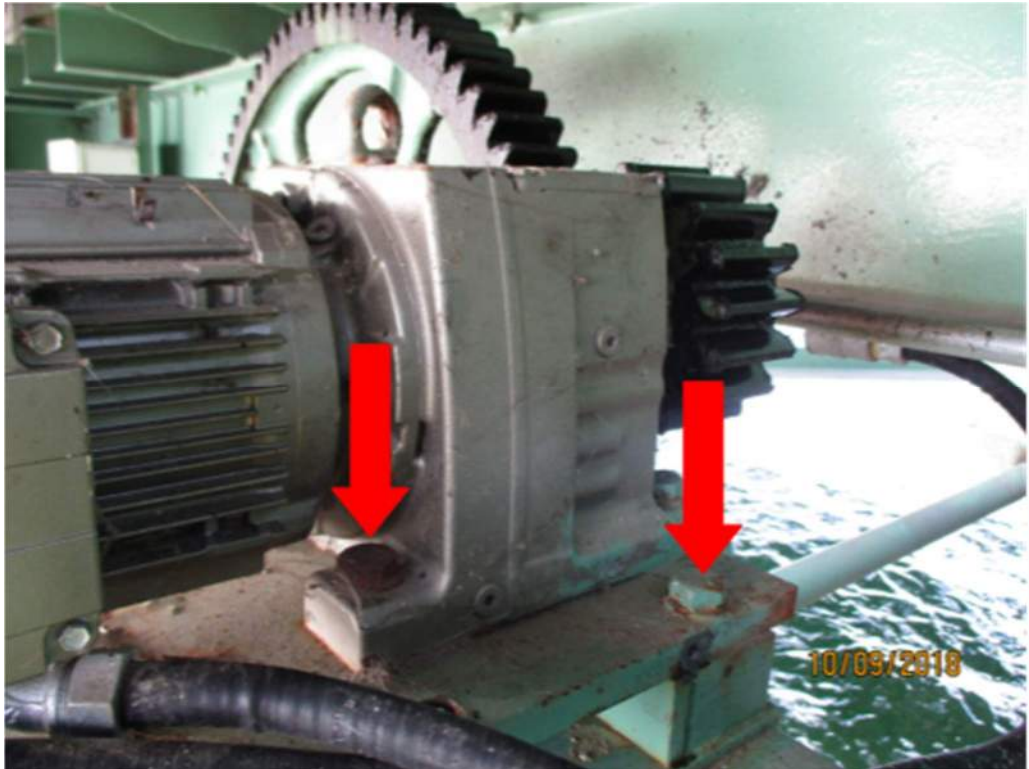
Span Lock Motor and Enclosed Speed Reducer. The mounting bolts and support for the motor and speed reducer are not fully painted and corroded.
